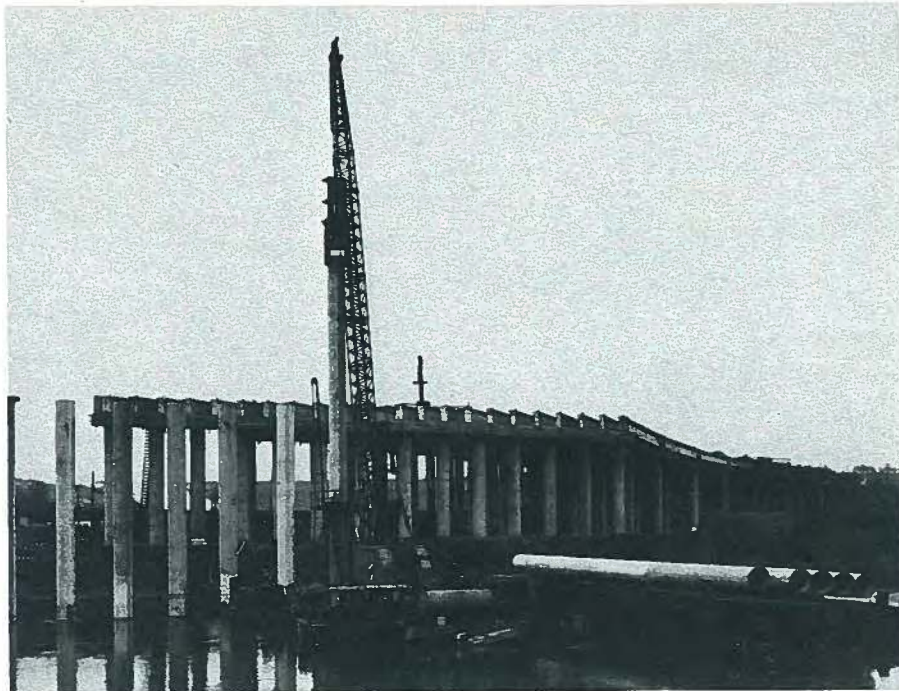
Prestensioned monolithic hollow piles for Evergreen Point Bridge project (1962).
